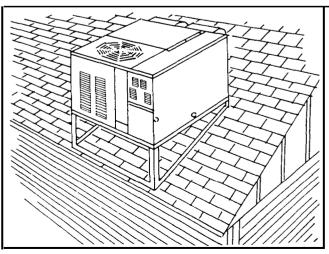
Pitched Rooftop Installation, Attic or Drop Ceiling Distributing System
